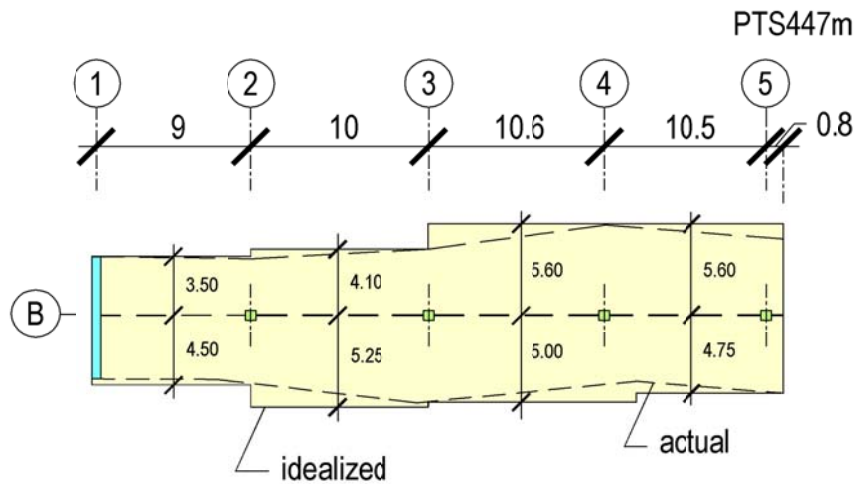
Top plan view of the design strip, showing span dimensions and the tributaries (m)
